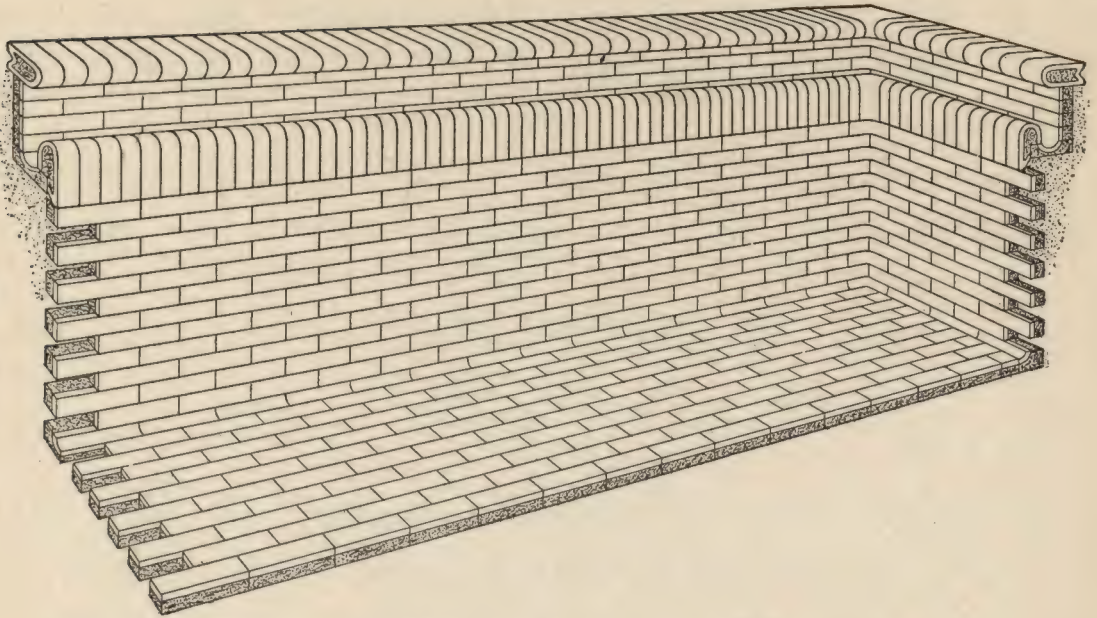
PART DETAIL OF SWIMMING TANK LINED WITH GLASS BRICK.
